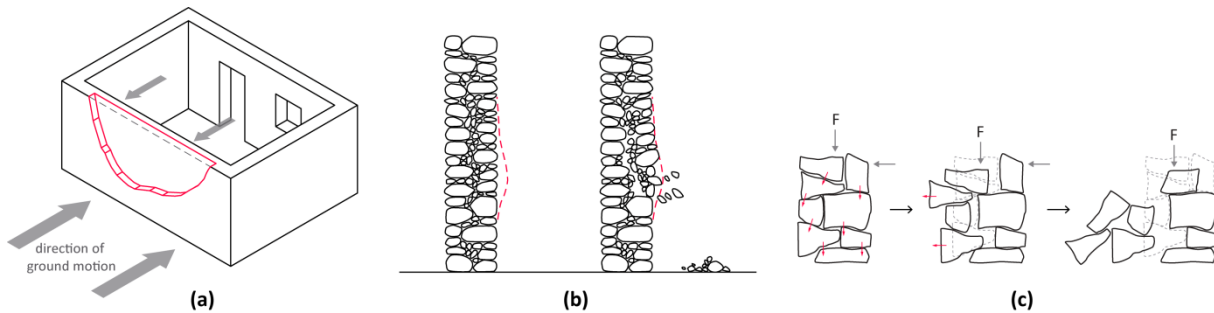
(a) Delamination of the wall leaf; (b) inner leaf causing the bulging of the exterior wall leaf (Giuffrè 1993); and (c) wall failure caused by the irregularity of stones (Bothara and Hıçılmaz 2008)
